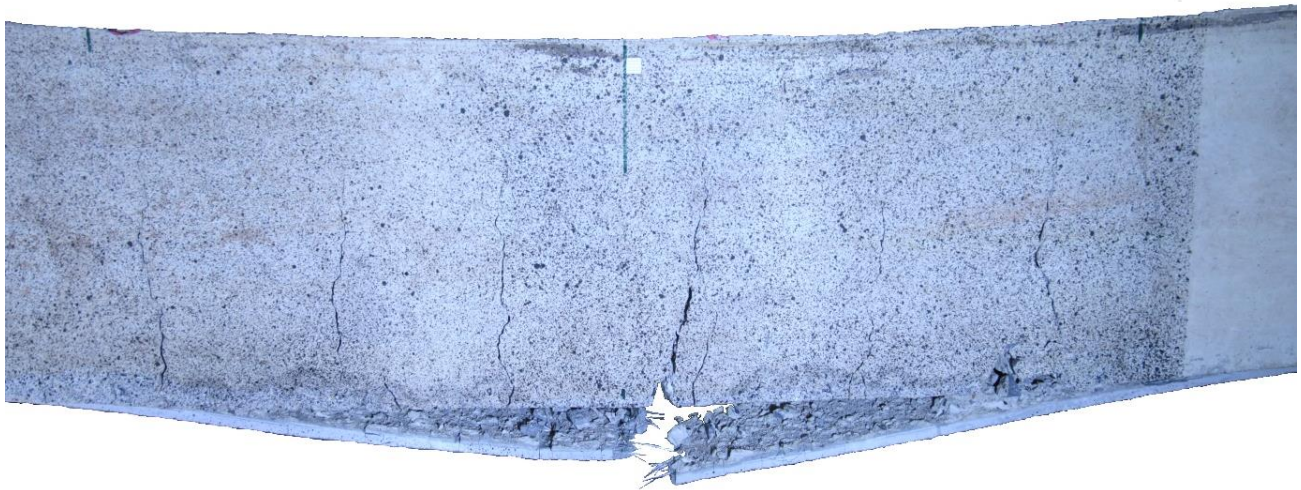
The mode of failure for beam B-S4-2 (rupture of steel textile).
